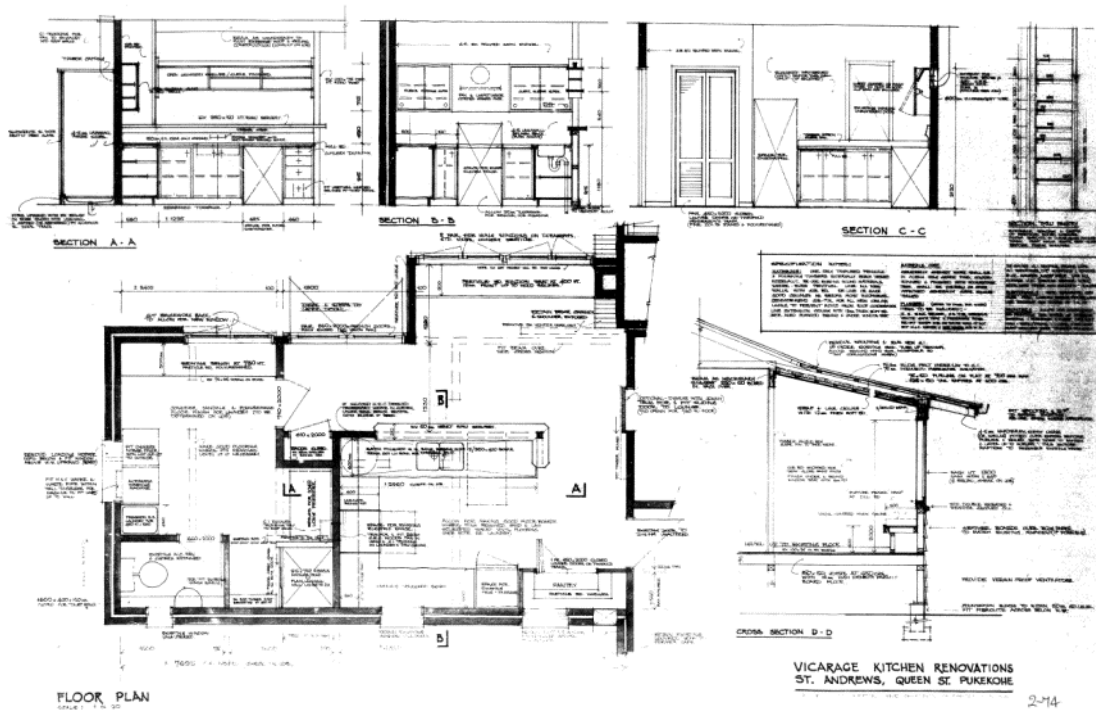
Plans, elevation and section drawings showing proposed kitchen renovations to the Vicarage, n.d. (Auckland Council property records).
